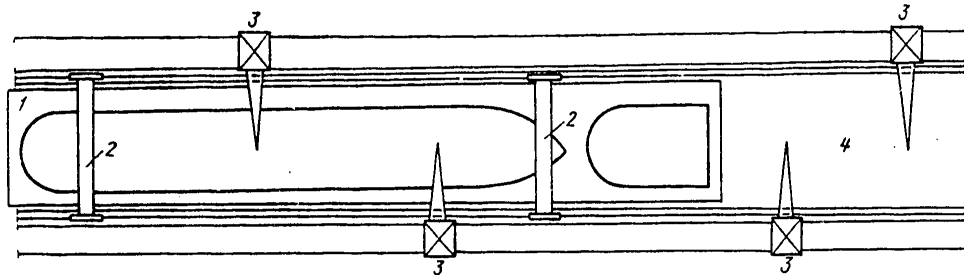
Layout of the crane equipment of a shipbuilding drydock for building large ships by the modular-sectional method with end platform for consolidation of sections and unitized units
